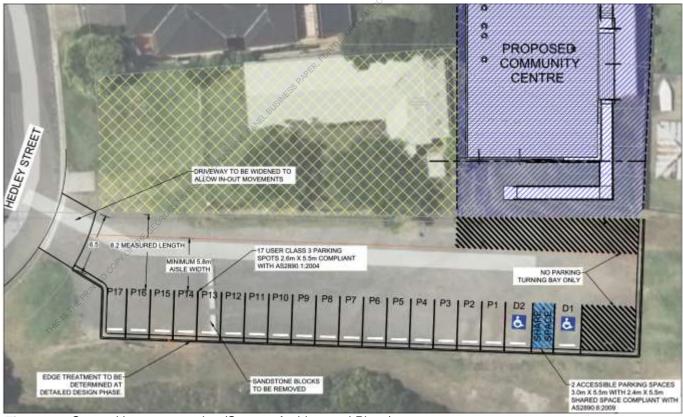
Car parking concept plan (Source: Architectural Plans)
